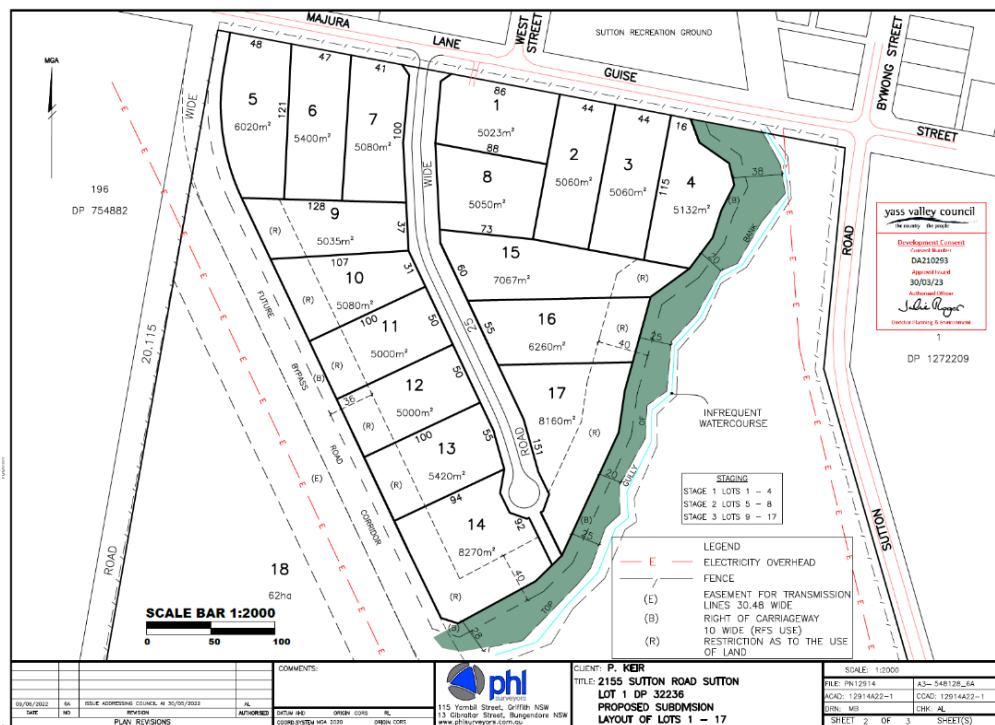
DA210293 Stamped Plans (Detail on R2 Residential Lots)
